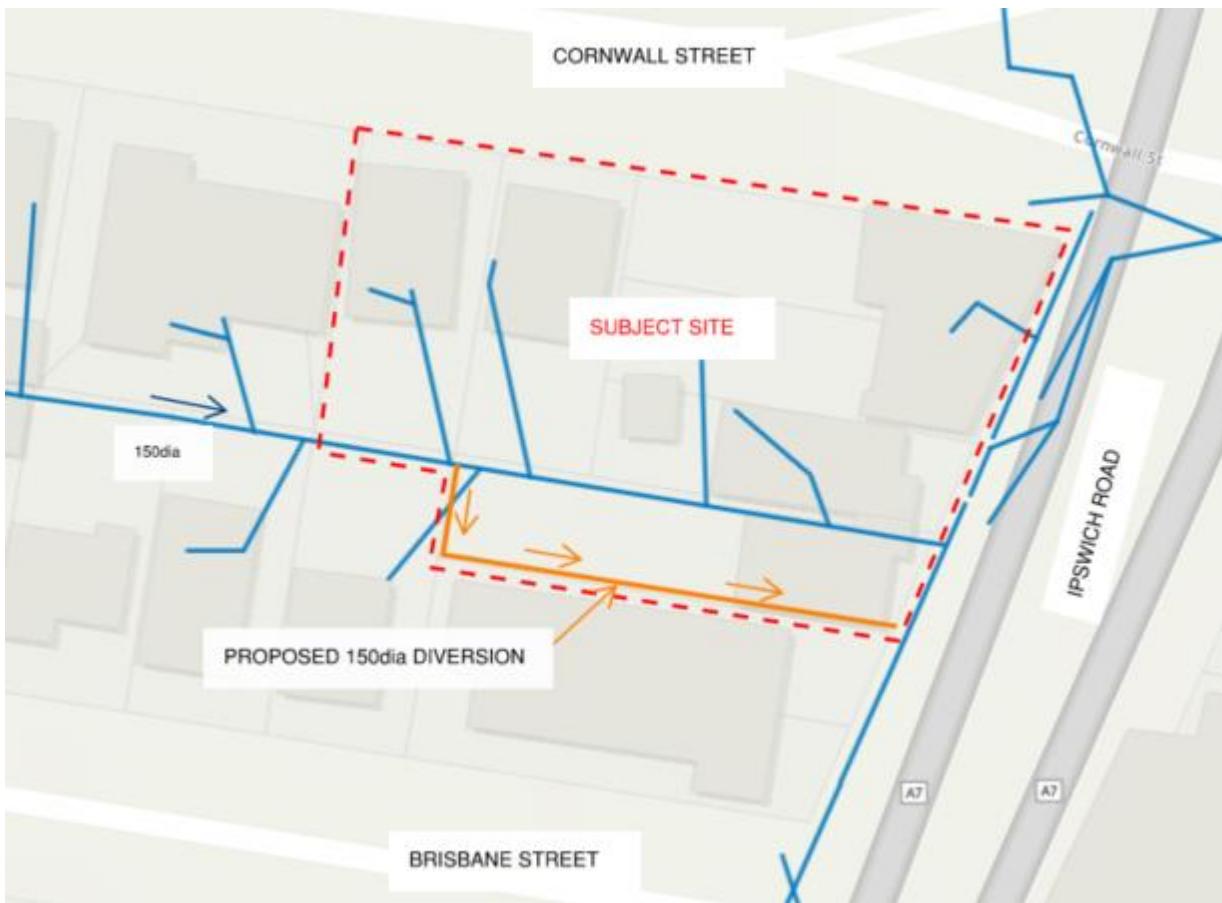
BCC Stormwater Pipe – Existing & Proposed Realignment
